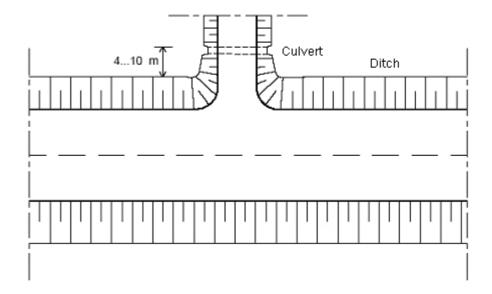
Principle of side ditch termination at minor road junction. Culvert is located further from the main road and there can be built a gentle slope as a side ditch termination.
